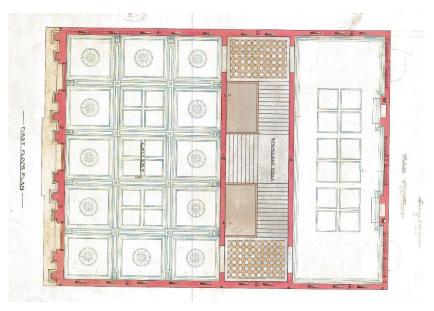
1888 first floor ceiling plan by Tappin, Gilbert and Denehy showing the original arrangement of the upper floor gallery spaces
